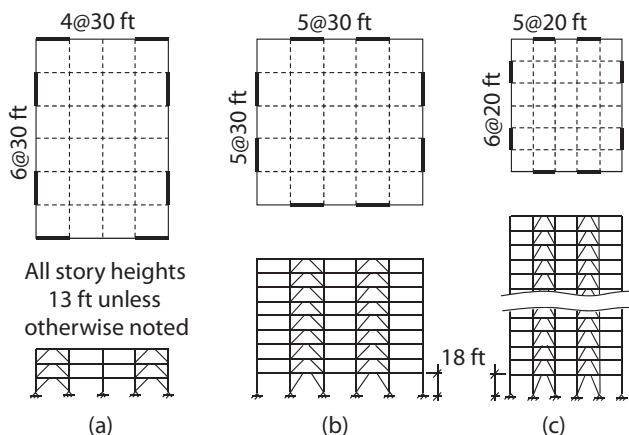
Plan and elevation views of EBF buildings: (a) 3-story, (b) 9-story and (c) 18-story.
